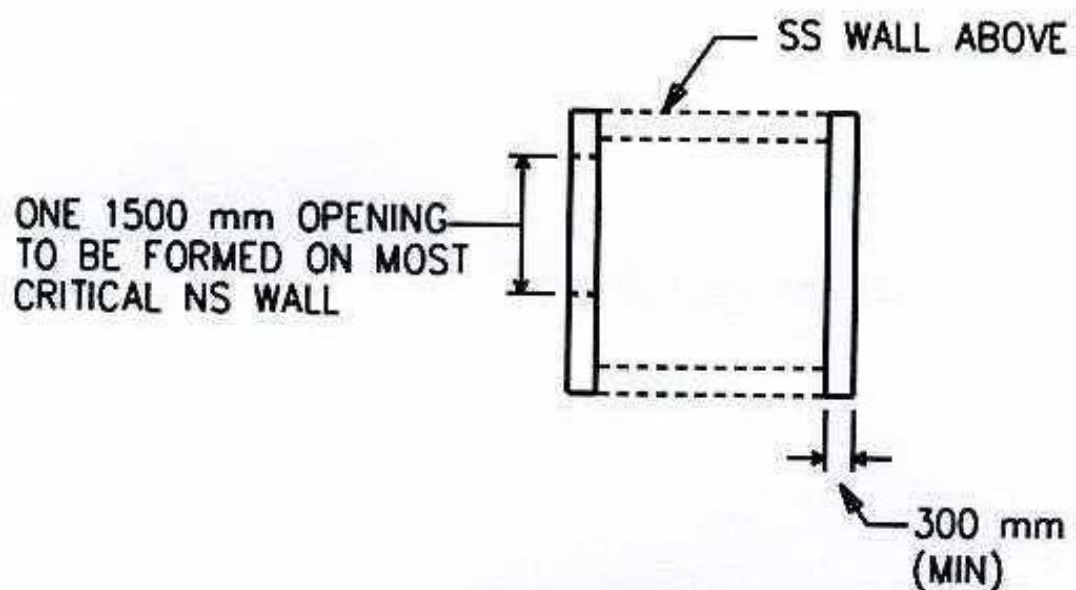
PLAN OF NS WALLS
